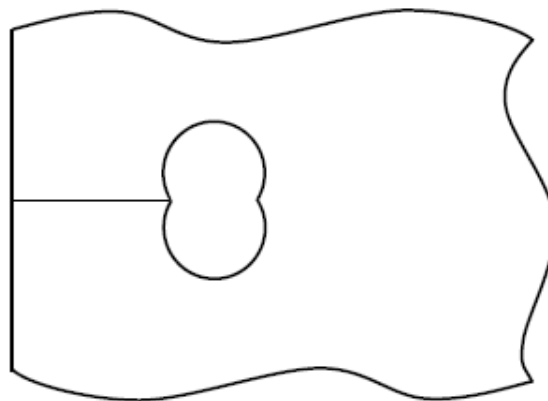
Double-Stop Drill Hole Technique. Adapted from [49].
